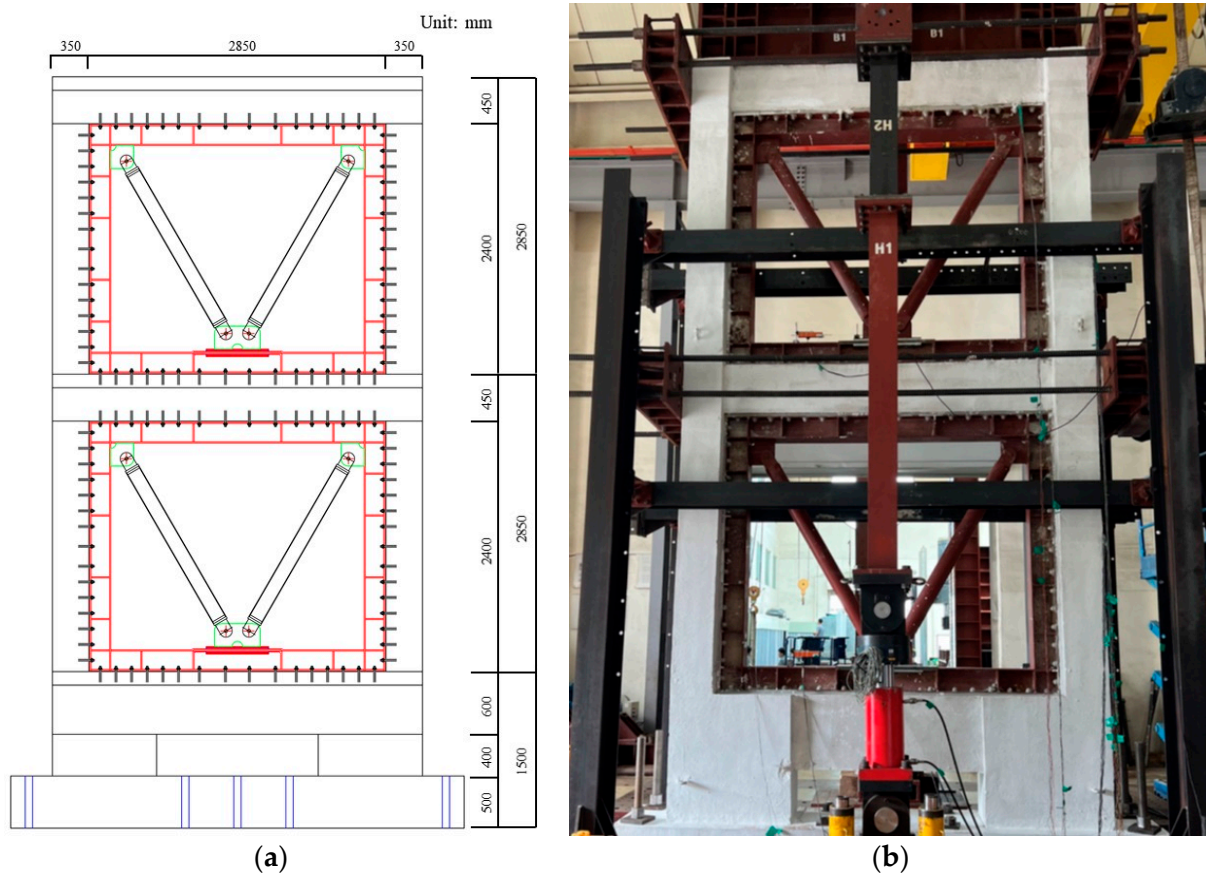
Detailed configuration of the specimens strengthened using the LLFD-V typed seismic control system (PD-LLFD-V): (a) specimen details; (b) photography.
